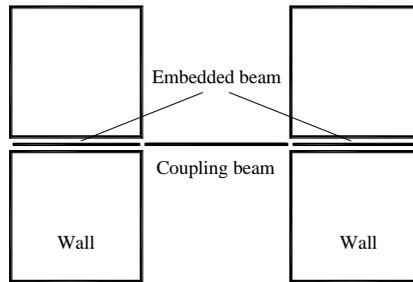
Connection between wall and coupling beam in PERFORM-3D
